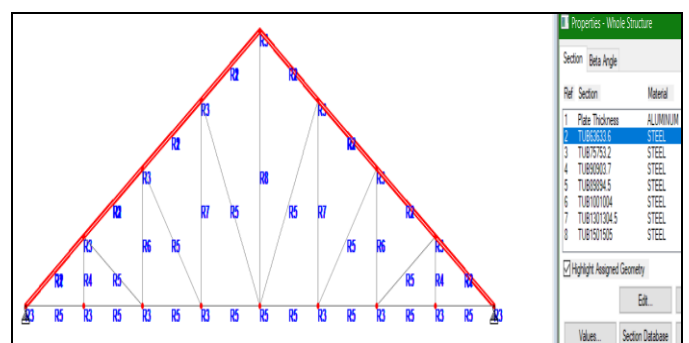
Property of Steel TUB 63 X 63 X 3.6 mm provided for above red colored Member of Steel Truss.
